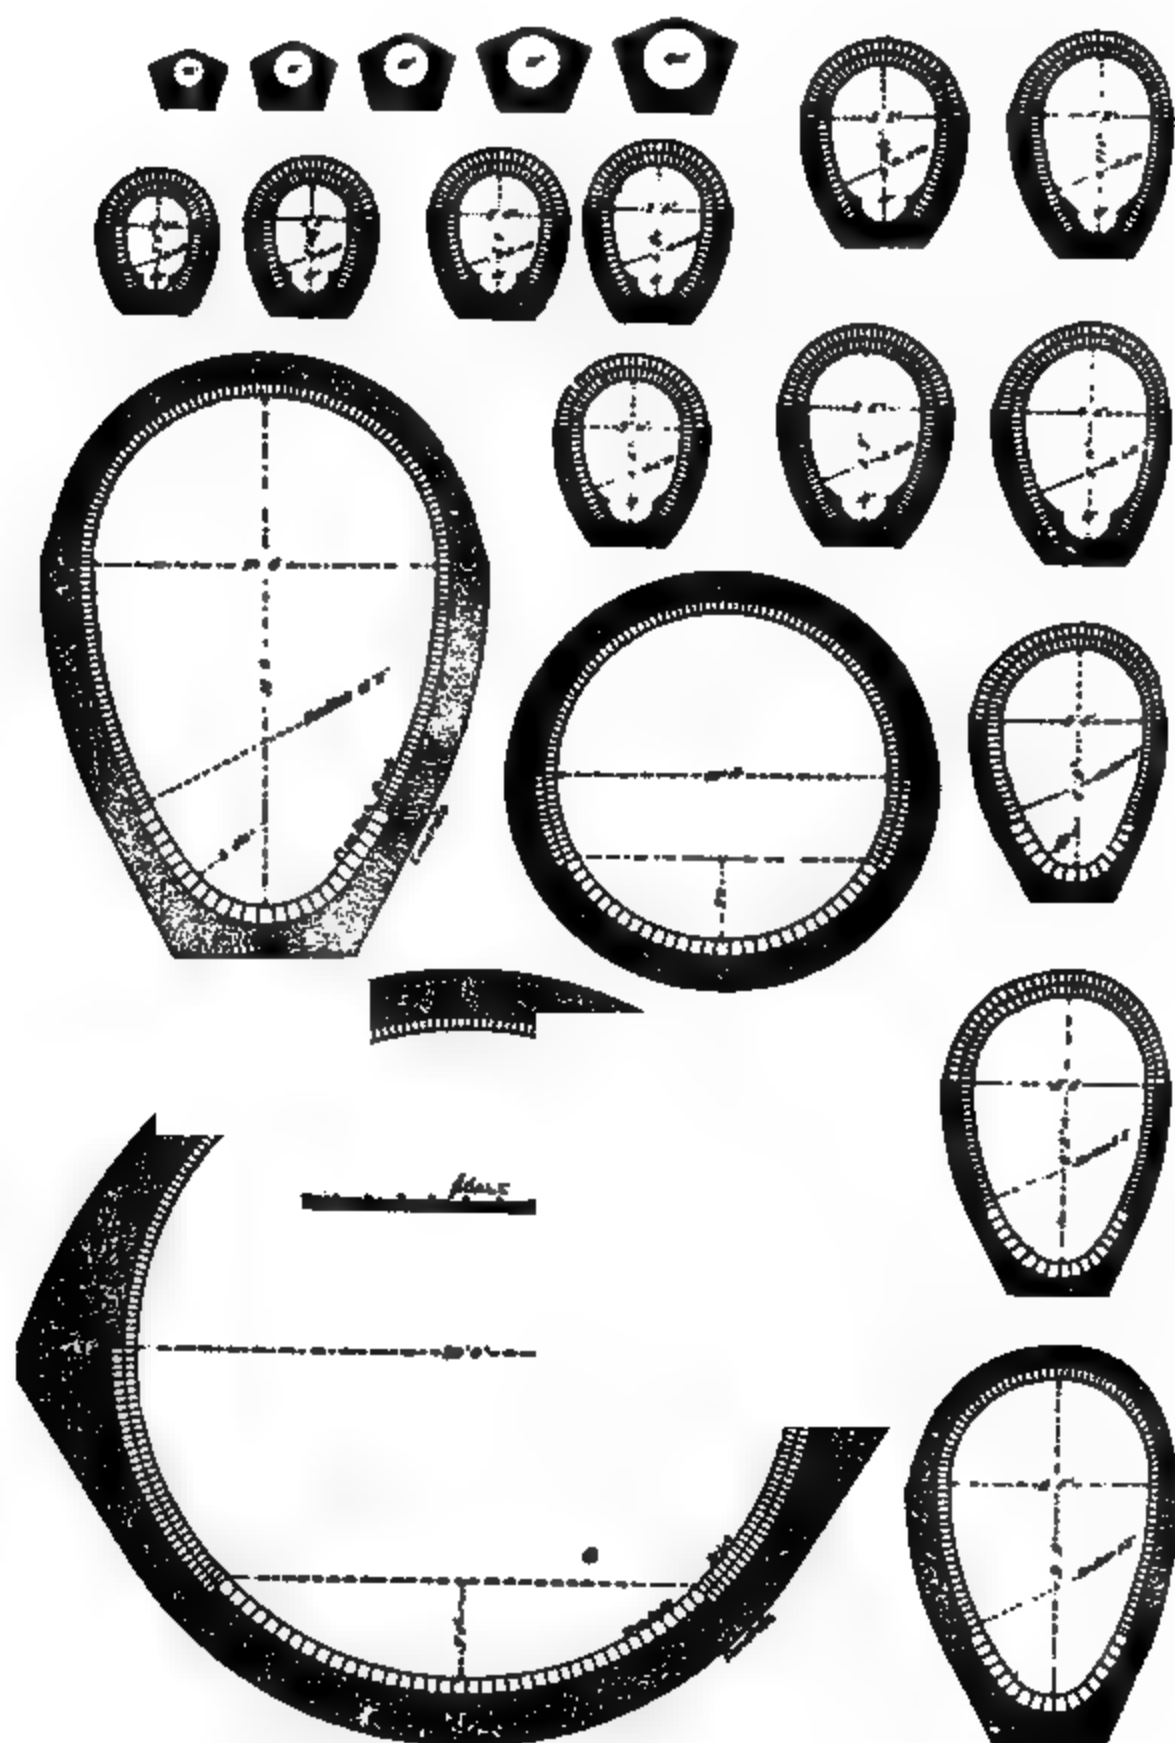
Standard Forms of Brick Sewers.—Washington, D. C.
